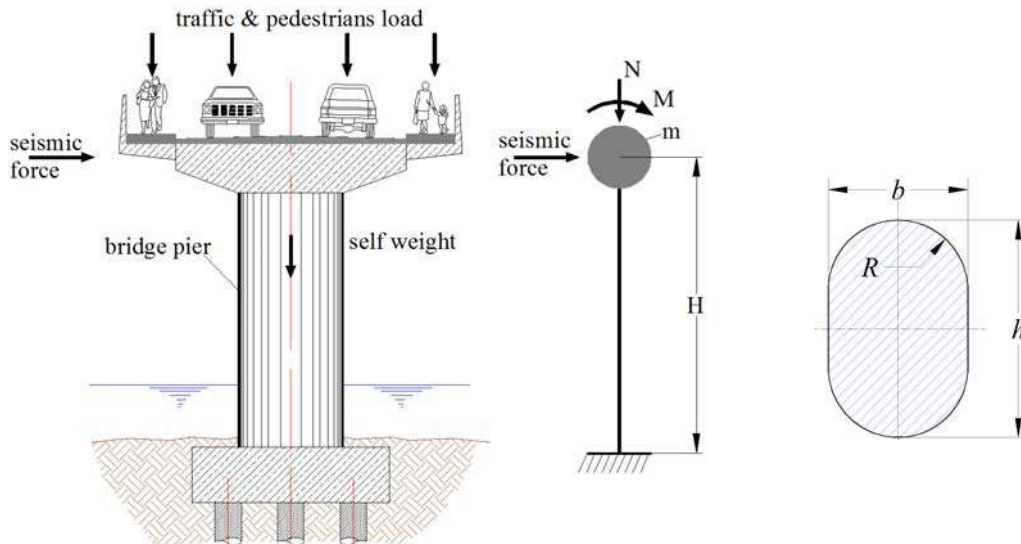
Section of the bridge showing the pier under analysis (left), structural model (middle) and cross section of pier (right)
